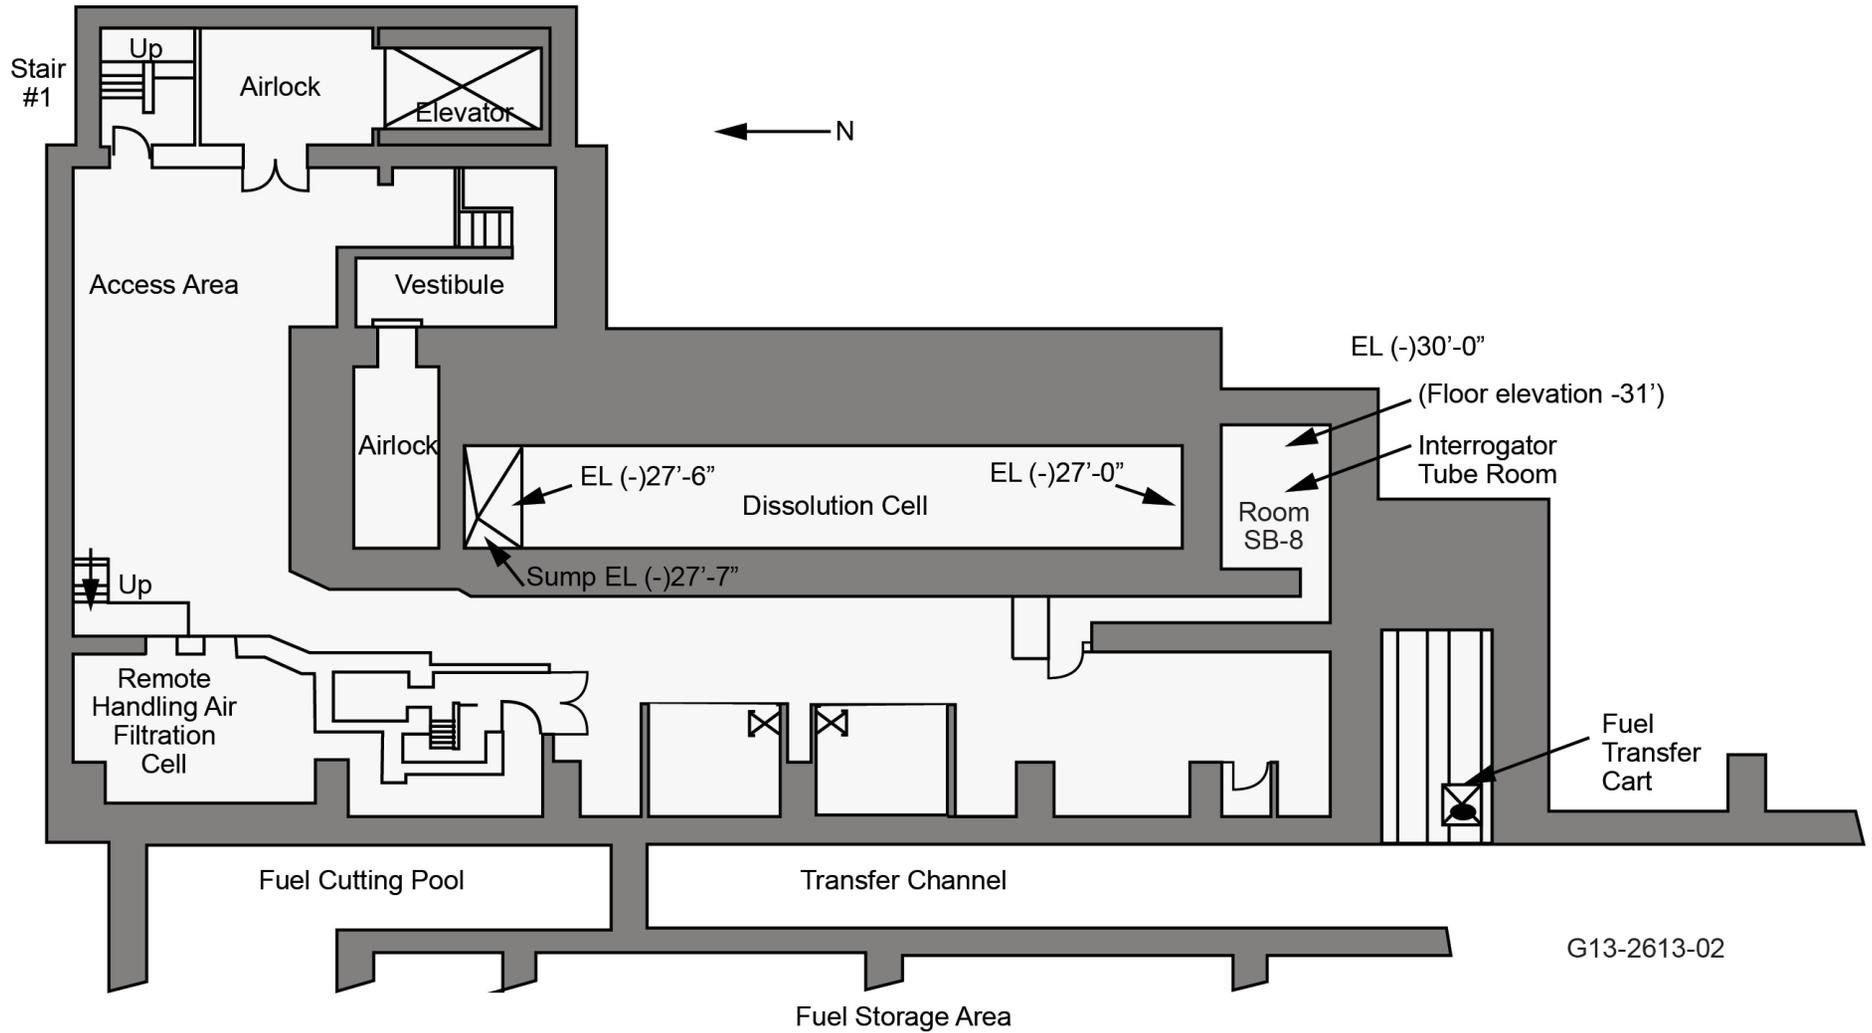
FDP cell floor (-27' 0" elevation).
